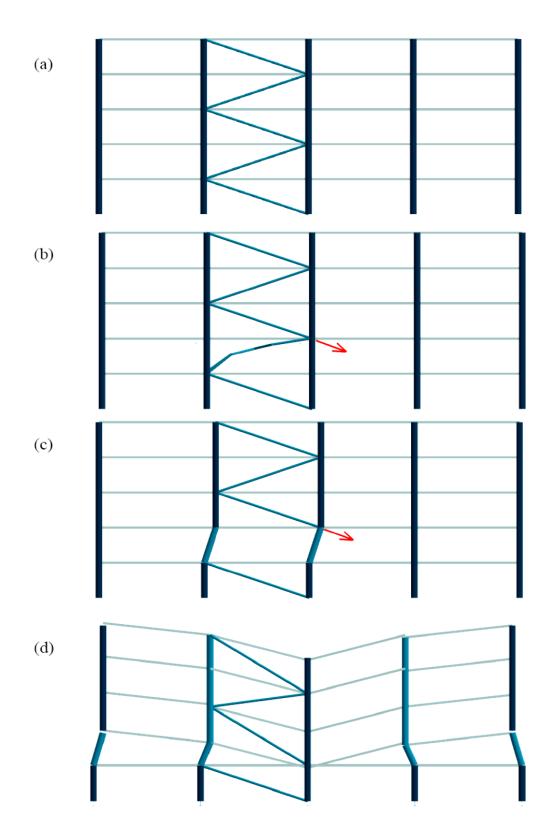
The steps of instability-type progressive collapse: a) the original structure with a bracing truss; b) initial failure in the truss; c) loss stability due to the lost part of the truss; d) the collapse due to the instability. (Johan R., 2010, p. 23)
